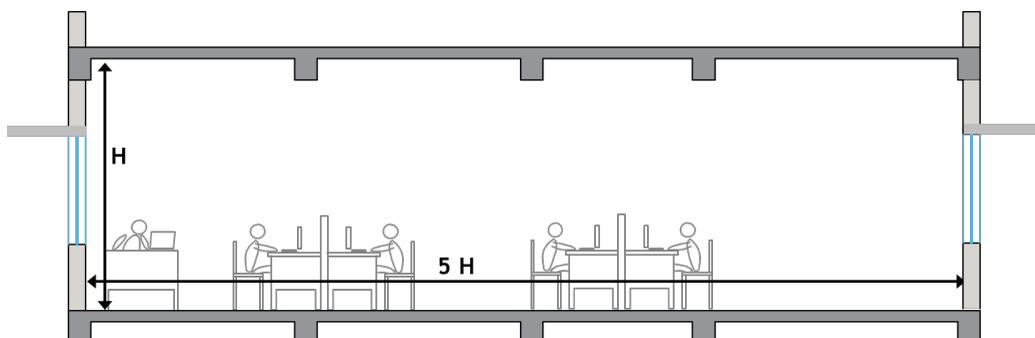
Single-sided Ventilation (Plan, Section and Elevation) - 2
